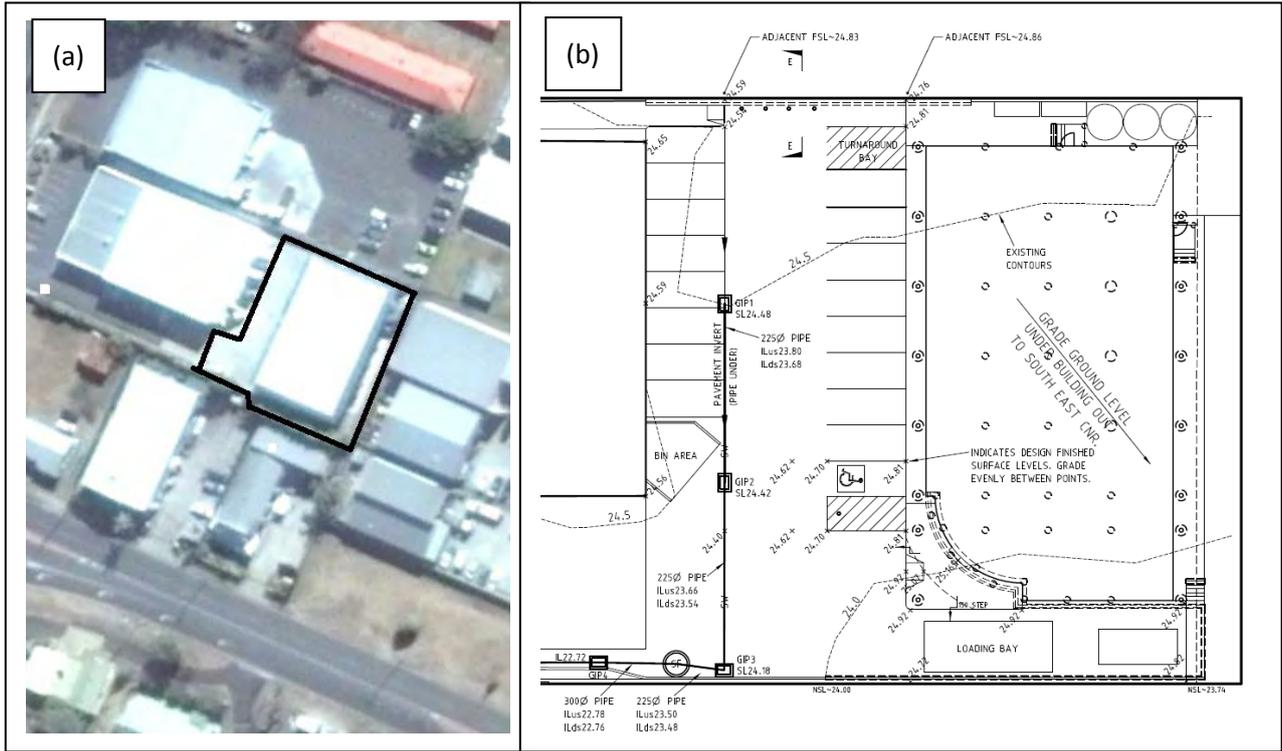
Study site: (a) aerial view; (b) drainage network plan
